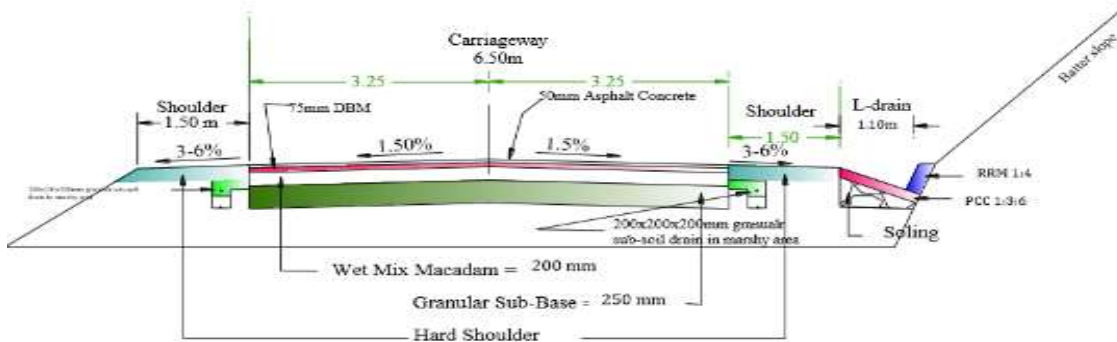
(1)- Design and Drawing aligned to Road Design Standard
